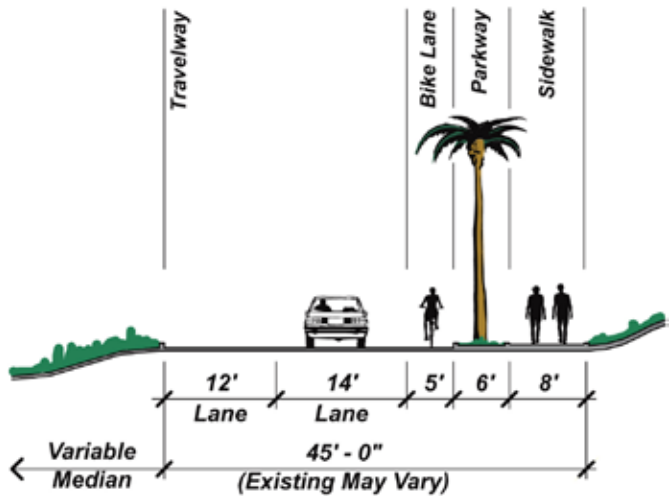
Typical cross section for Rattlesnake Canyon Road.
